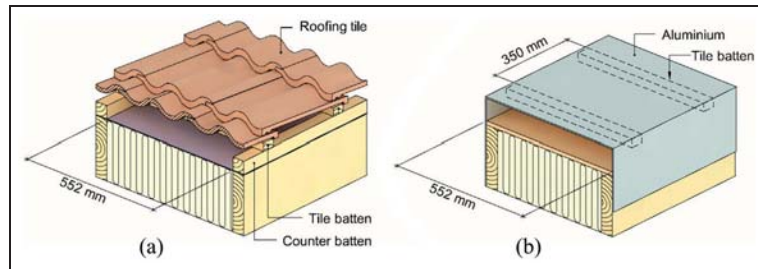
(a) Cross section of a typical roof construction with roofing tiles. (b) A cross section of the test model consisting of an aluminium box corresponding to the air gap between two counter battens with a width of 48 mm and a centre-to-centre distance of 600 mm. The centre-to-centre distance of the tile battens is 350 mm.
